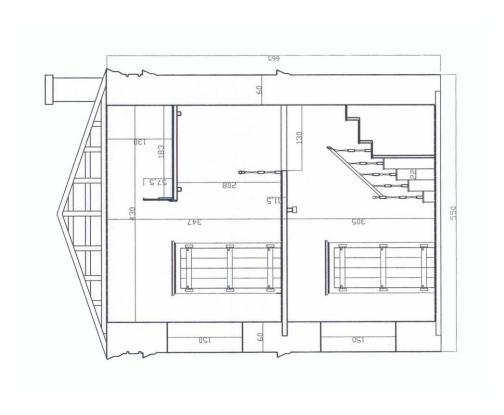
Section B-B view of 39-Türkkuyusu Street Scale: 1/75
